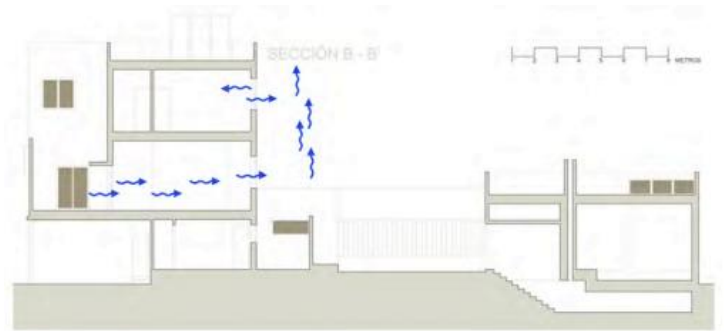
11 Section and cross ventilation of "Casa Gilardi"
